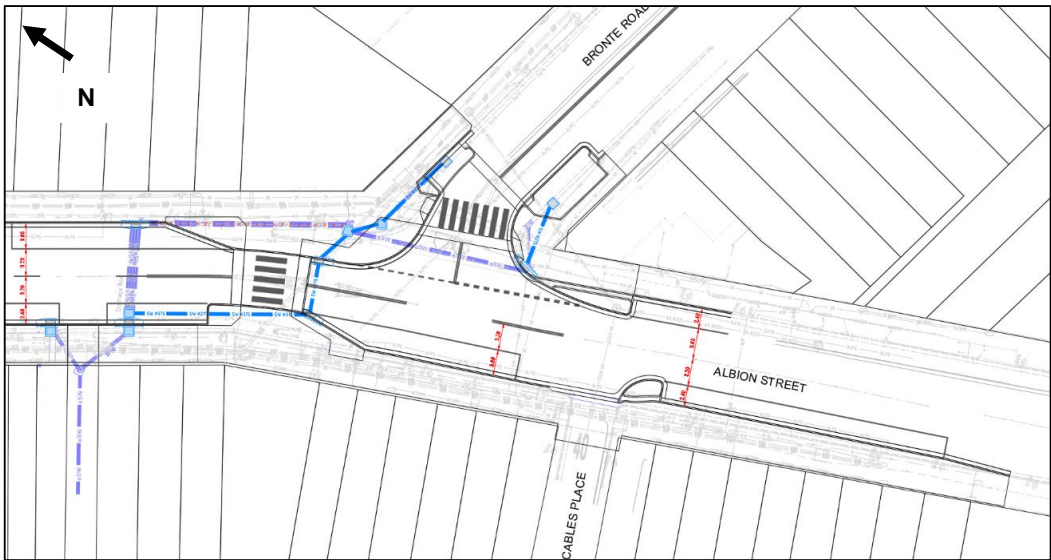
Proposed Bronte Road Public Domain Works plans, prepared by TTW
